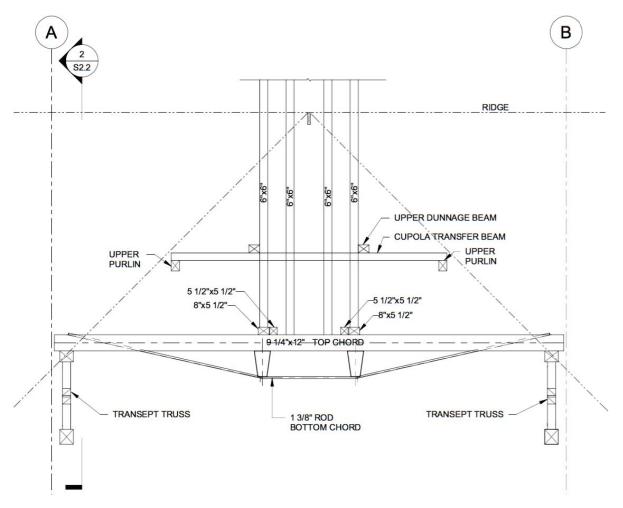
Existing Cupola Support Framing and Cupola Truss Elevation
